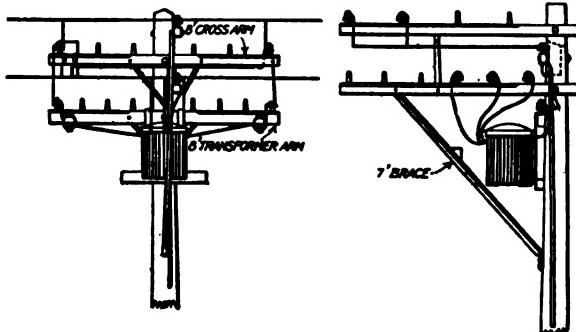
TYPICAL CONSTRUCTION FOR SMALL TRANSFORMER INSTALLATIONS
